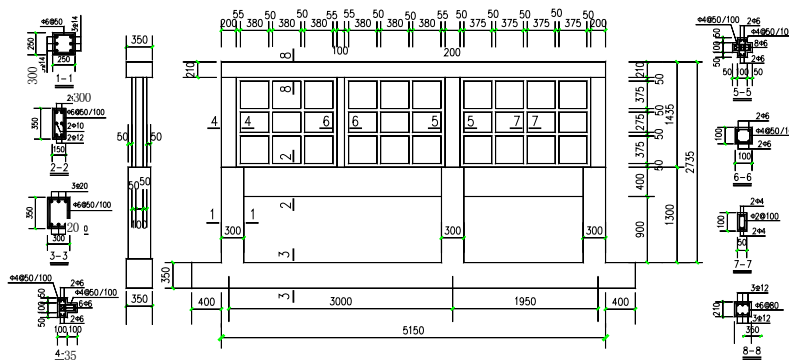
Geometry dimensions and reinforcement details of specimen KZML-2
